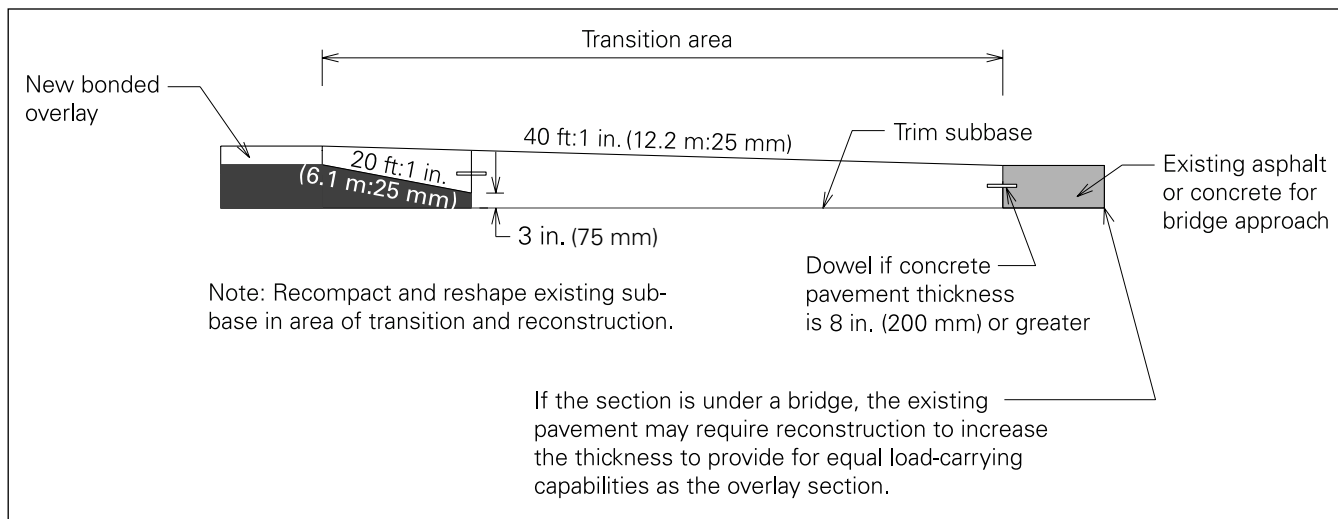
New transition tapers used to meet bridge approach slabs or maintain clearance under bridges with bonded overlay of asphalt pavement (adapted from ACPA [1991])
